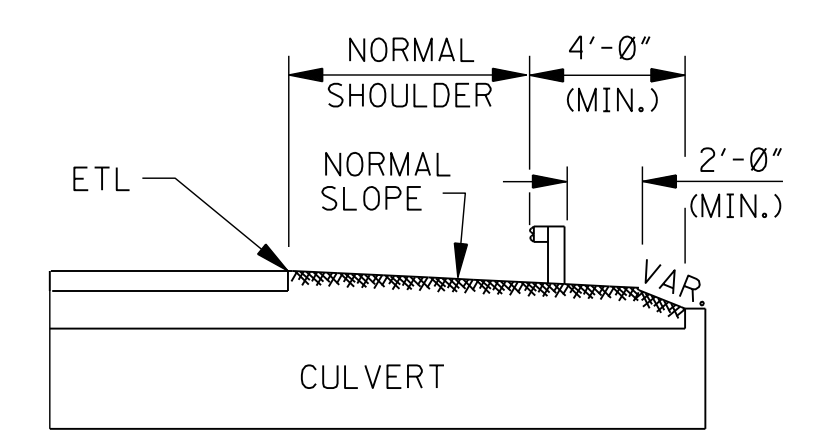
DETAIL OF POST INSTALLATION WITH COVER LESS THAN NORMAL POST LENGTH
